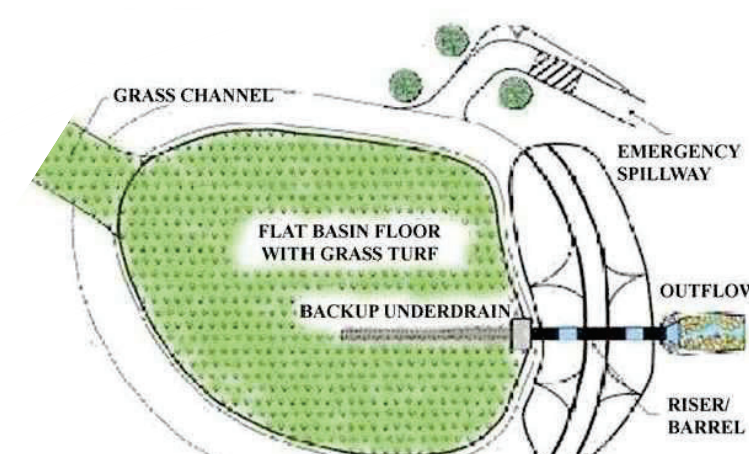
Schematic design of constructed infiltration basin with concrete level spreader (Schueler, 1990).
